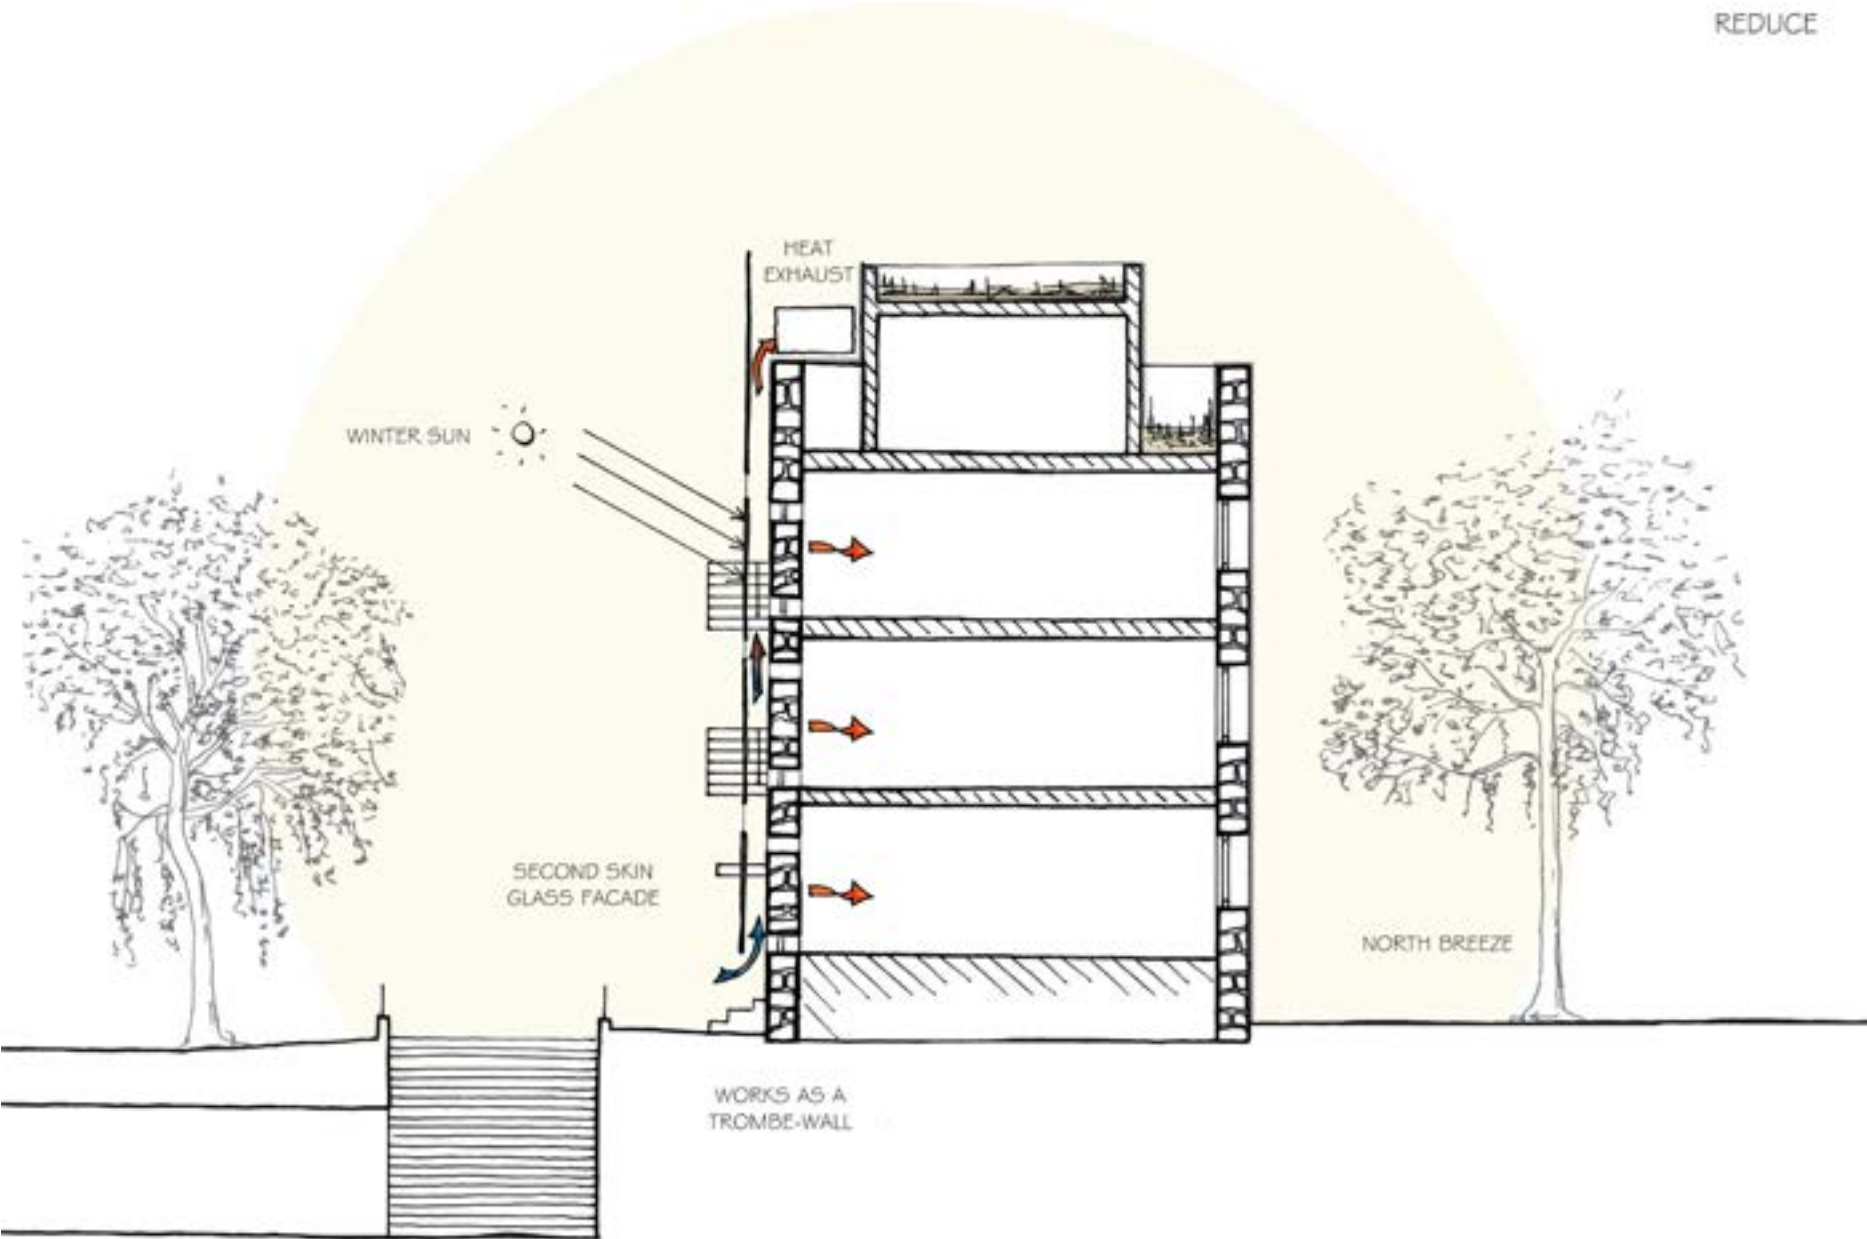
Author (2022). Section of the first building of Prosfygika - Reduce (second skin facade, winter) [Sketch].
